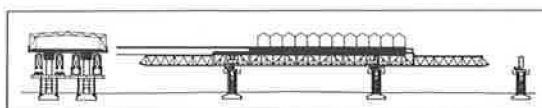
, a & b Ohlstadt Bridge, West Germany - Bridge & Formwork System
